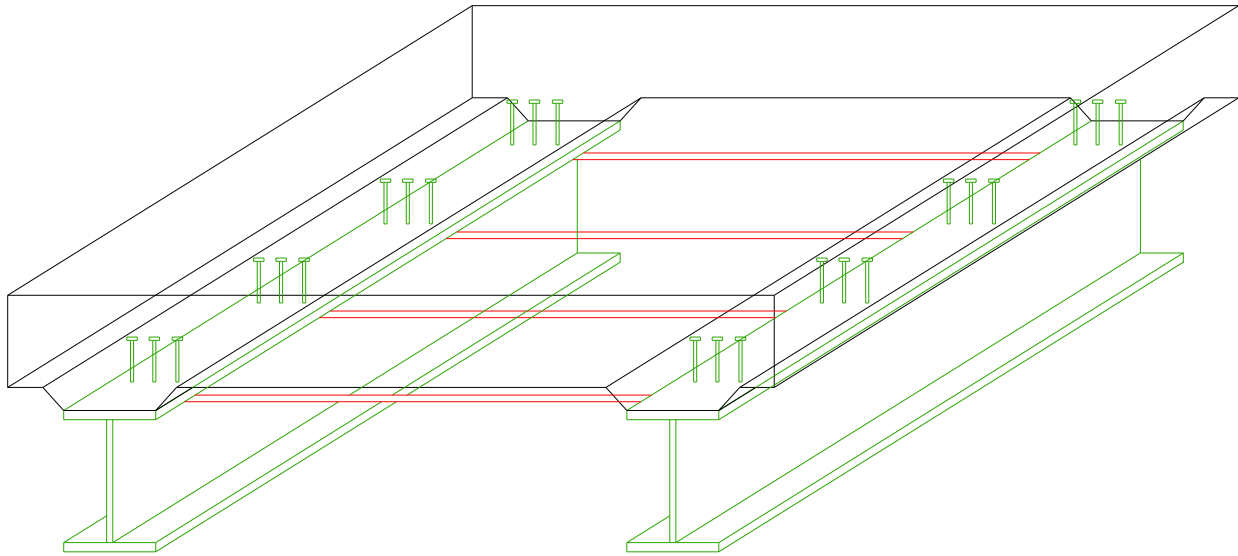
Typical bridge deck slab using first generation steel-free design method. Red signifies bottom transverse steel straps
